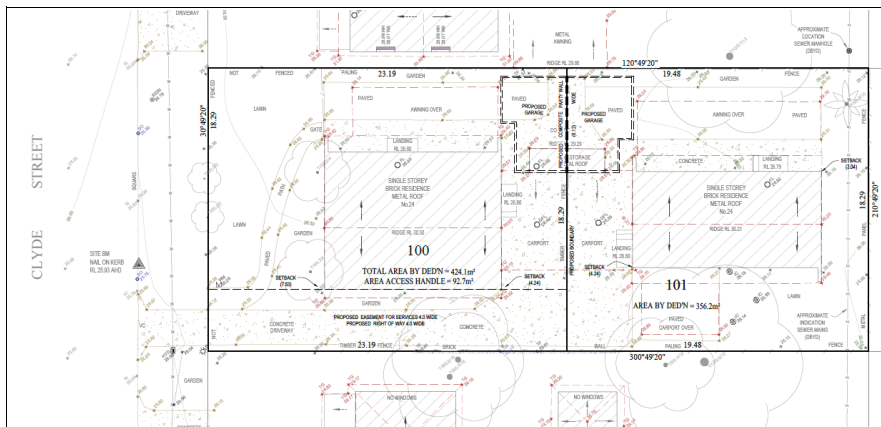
Extract from the proposed plan of subdivision (source: H&S Land Surveyors)
